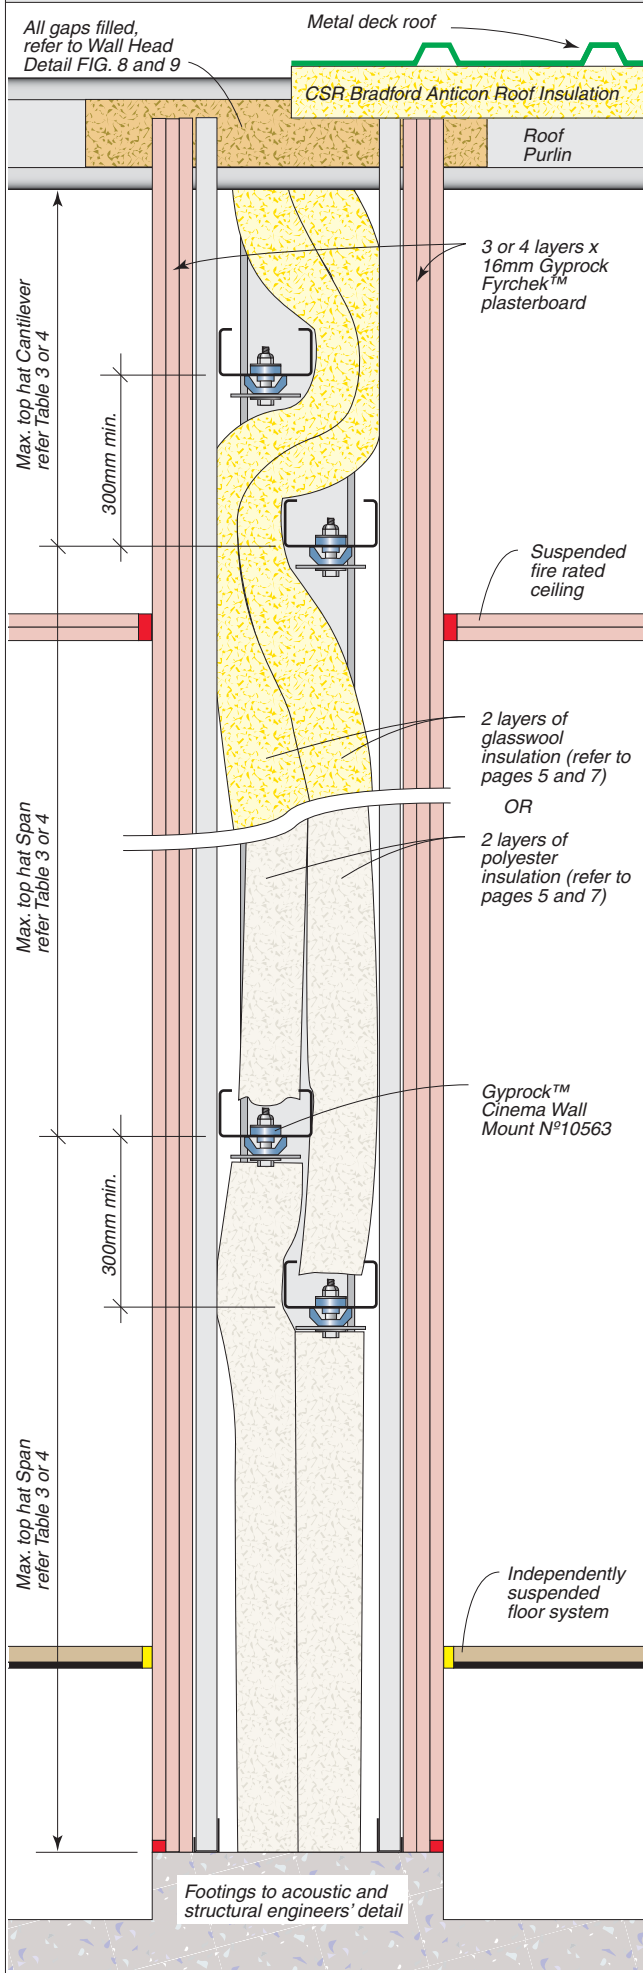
TYPICAL WALL CROSS SECTION – PLAN
